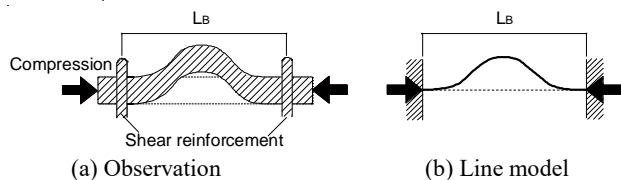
Conceptual figures of reinforcing bar reinforcement
